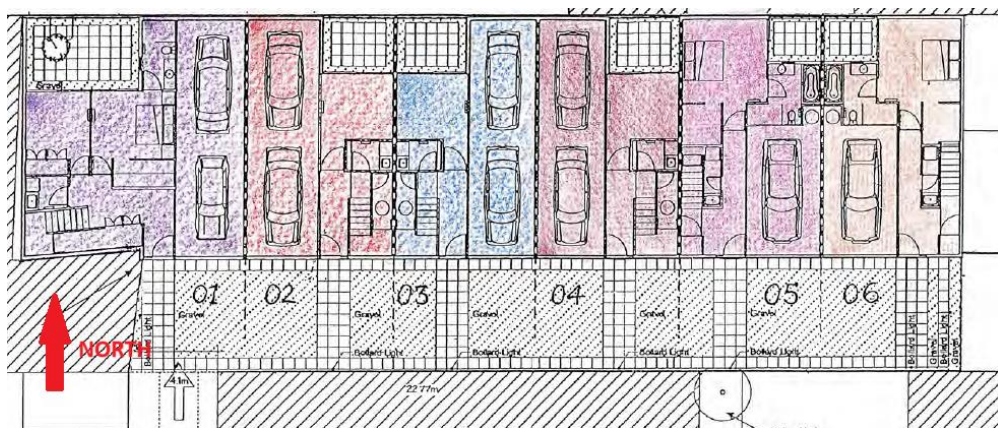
No. 7 Sanders Place endorsed ground floor plan (PL01/0765)
